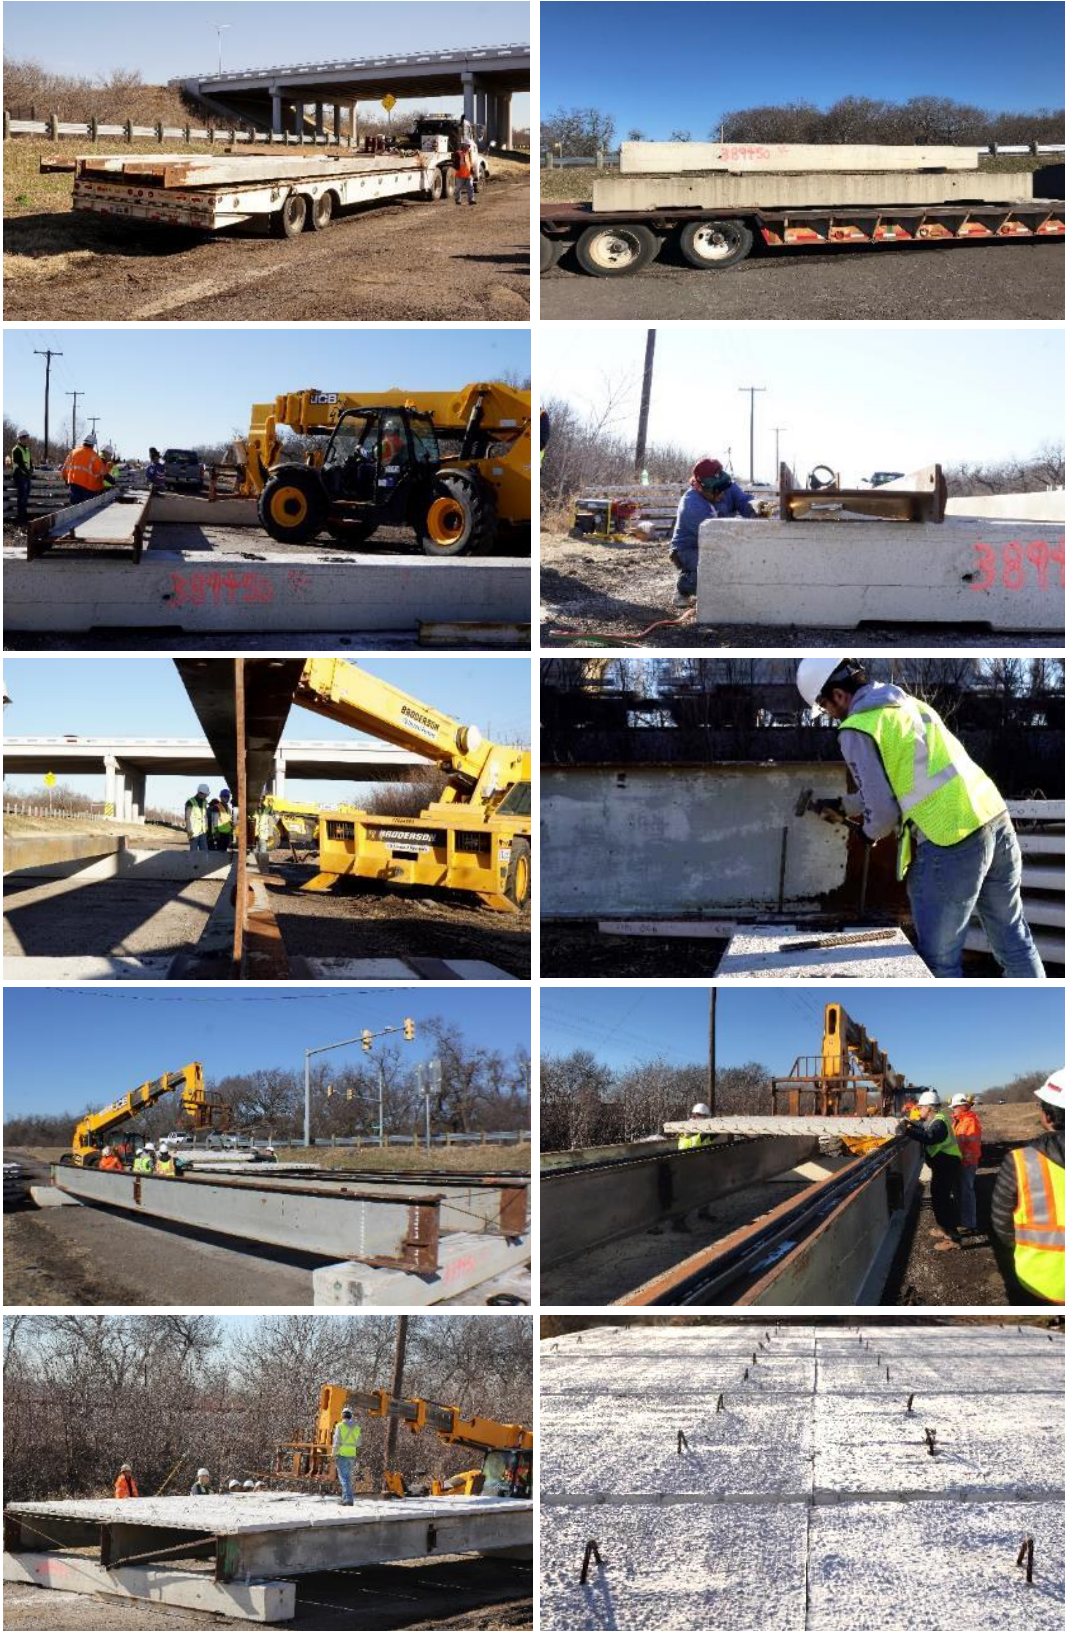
Construction process of stage 1: Bridge deck set-up
